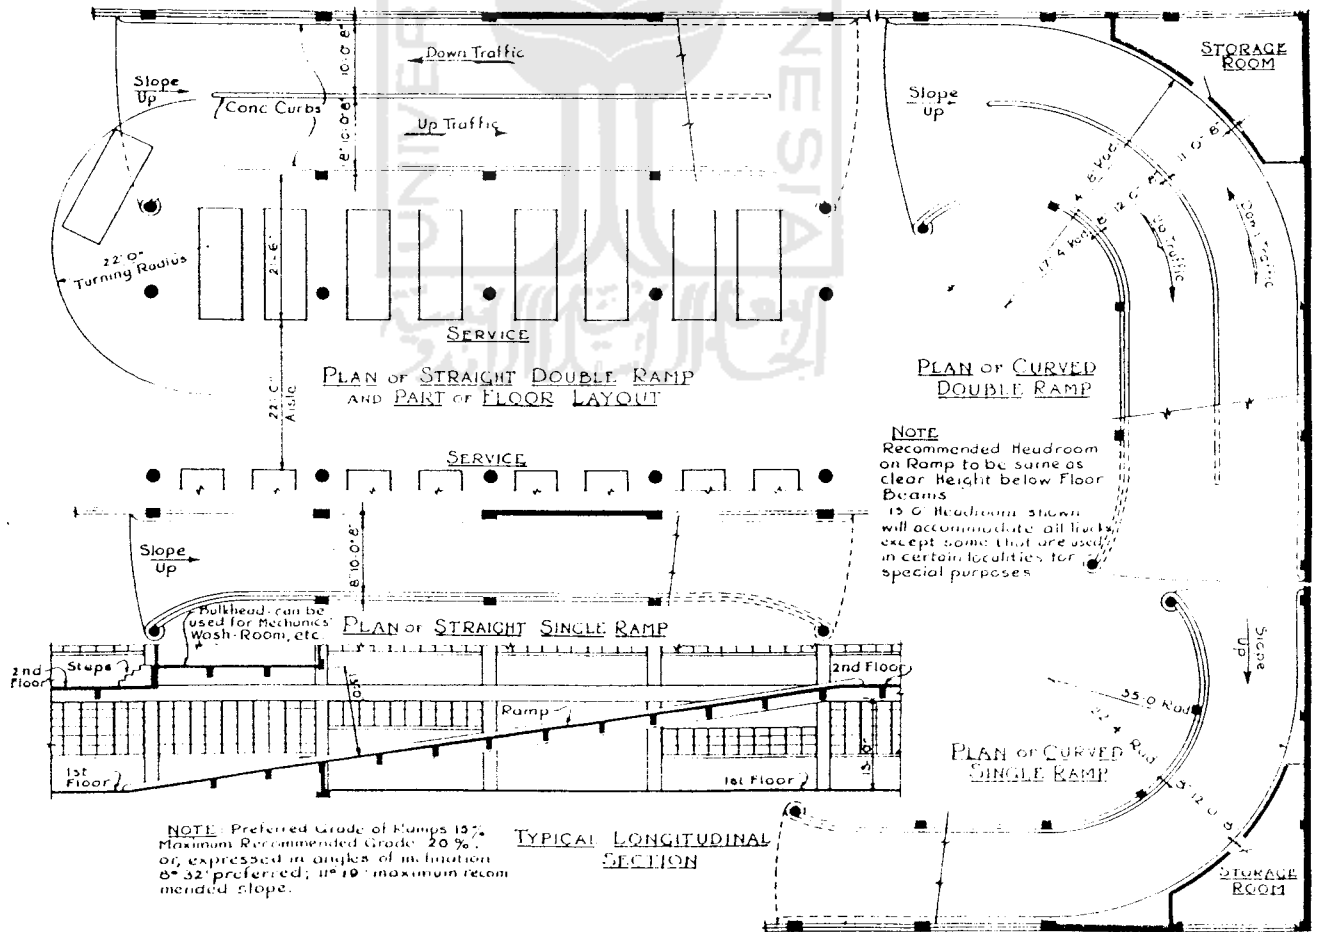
Ramp design. (Chevrolet Motor Division, Building Department, Detroit, Mich.)
